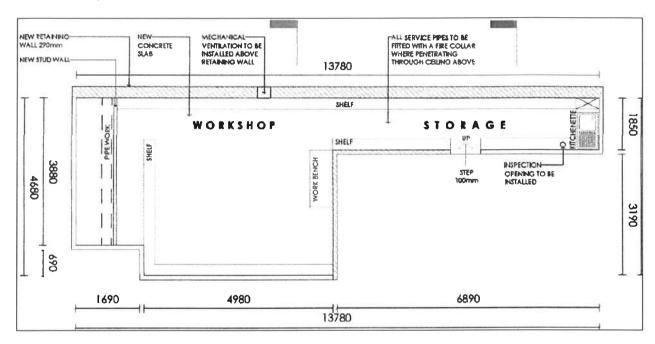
Layout of space at the rear of Shop 2 accessed via a step off the main shop floor (Source: Applicant's plans)
